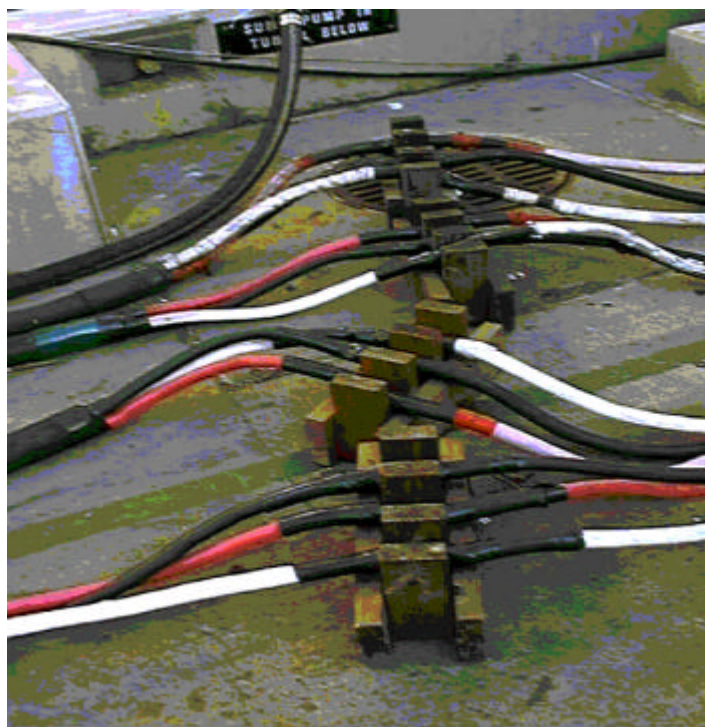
kV pier electrical outlet assembly and outlets.
